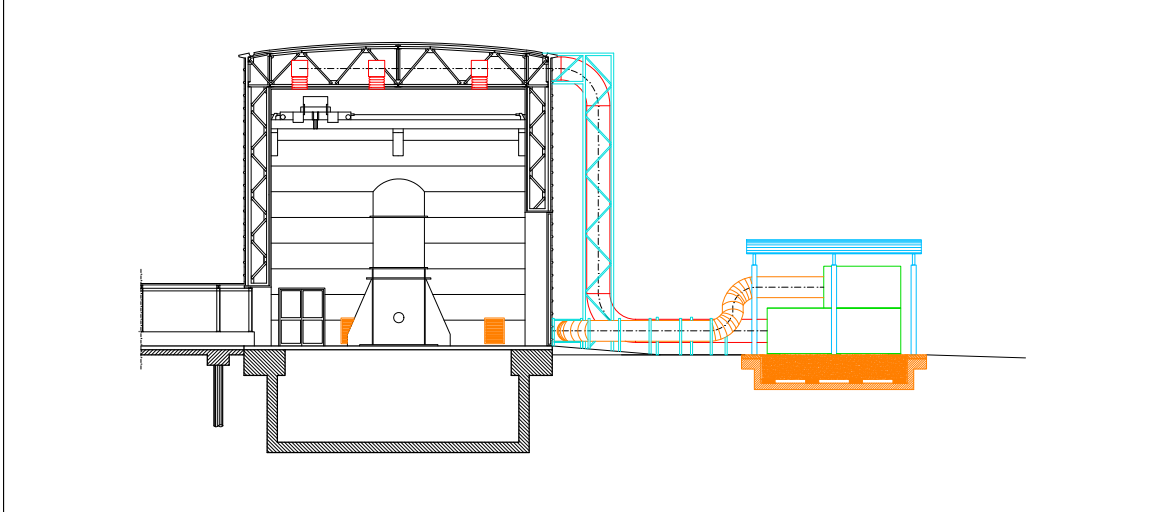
Cross section of the MC building; experimental hall HVAC system.
